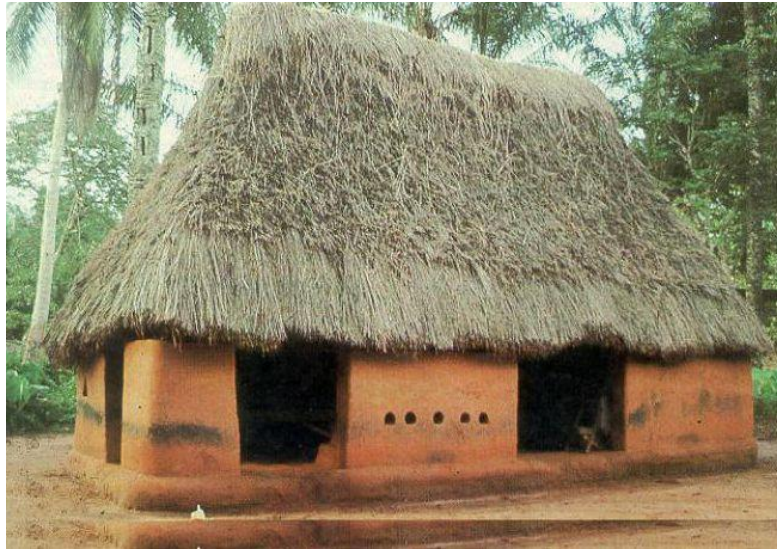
Pictorial View of thatch used as a roofing material. Source: [Igbo Architecture | Ulo omé n'Ìgbò - Culture - Nigeria \(pinterest.ca\)](#). Retrieved July 2024.
